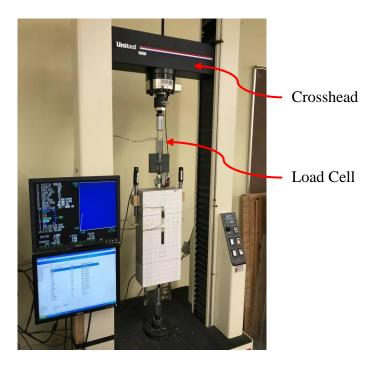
Headed Bar Pullout Specimen in United Testing Machine
